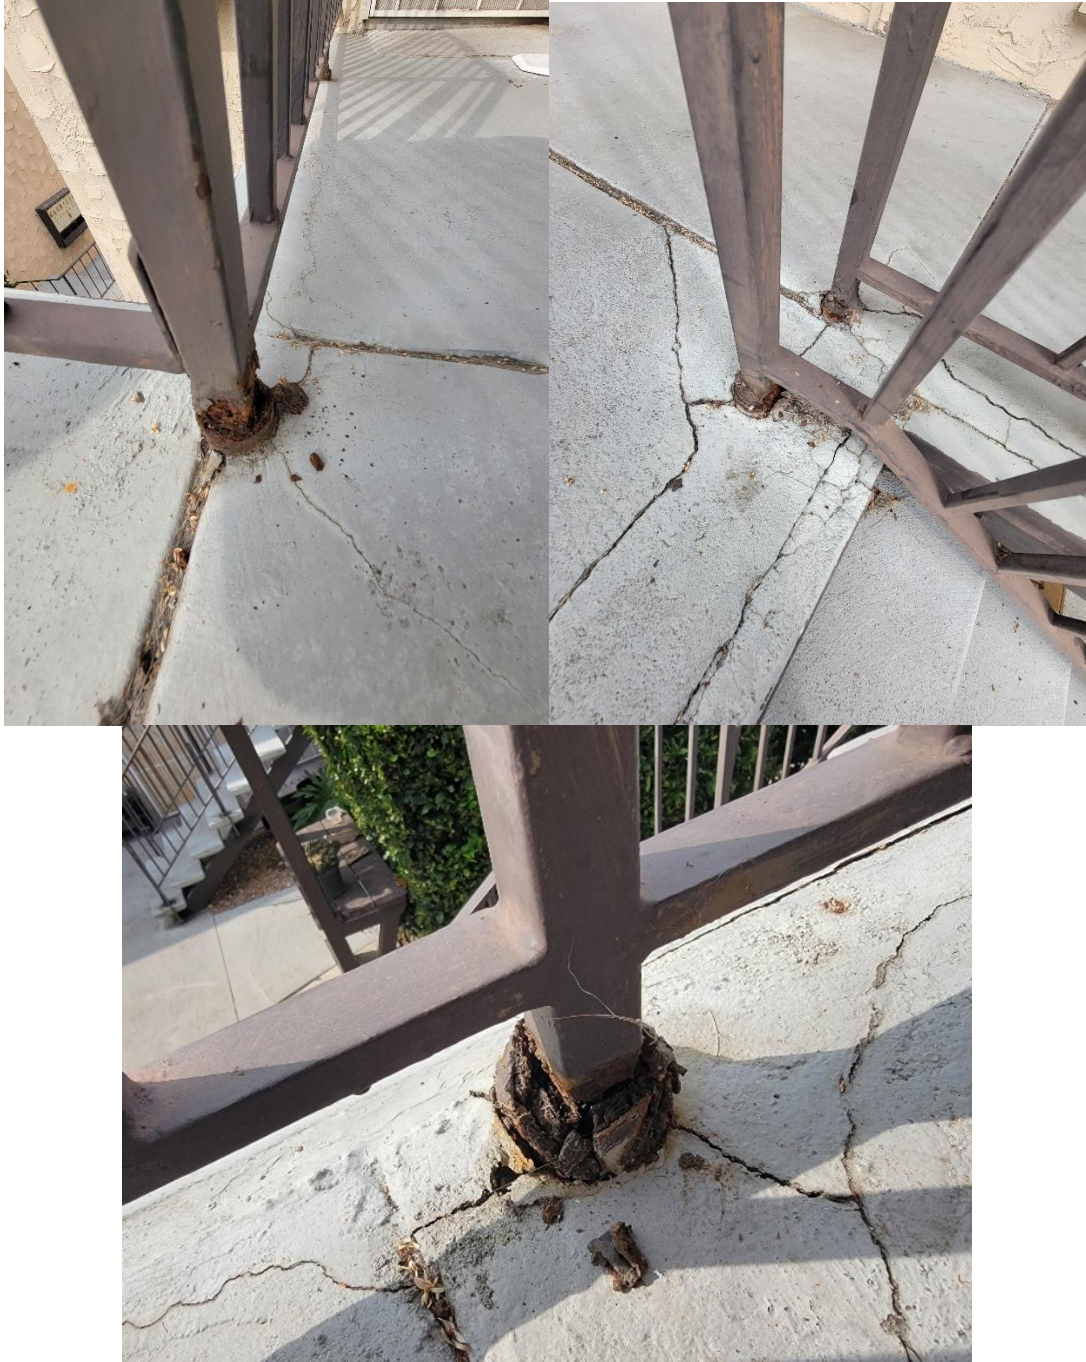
Different non-standard post anchorage to the concrete treads and steel stringer
